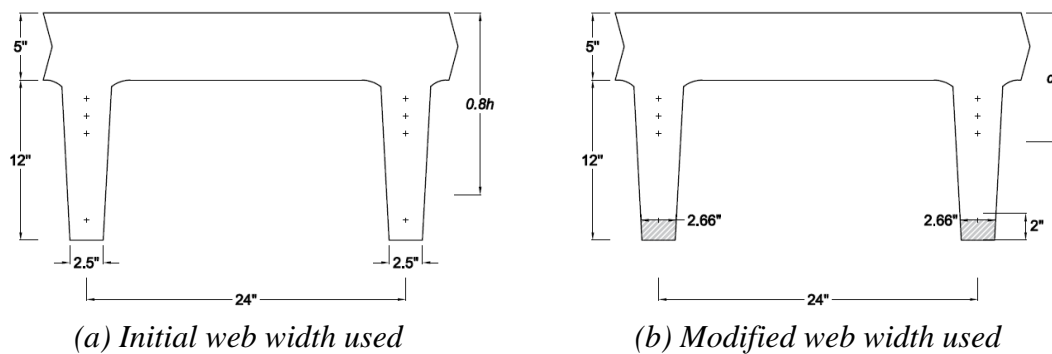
Concrete web width used for calculating concrete shear strength.
